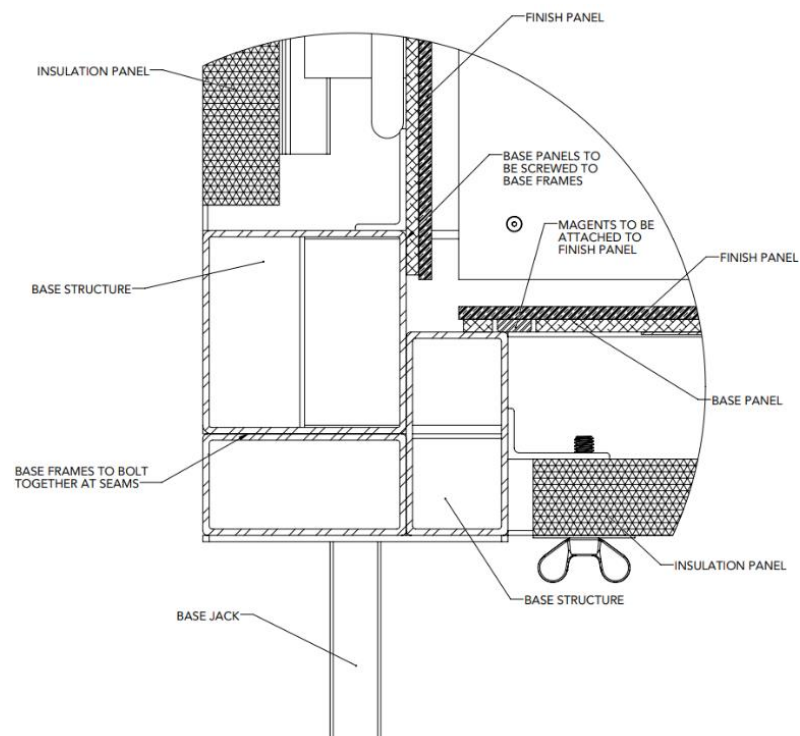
HBIL - detailed sectional view of thermo-activate panel assembly
